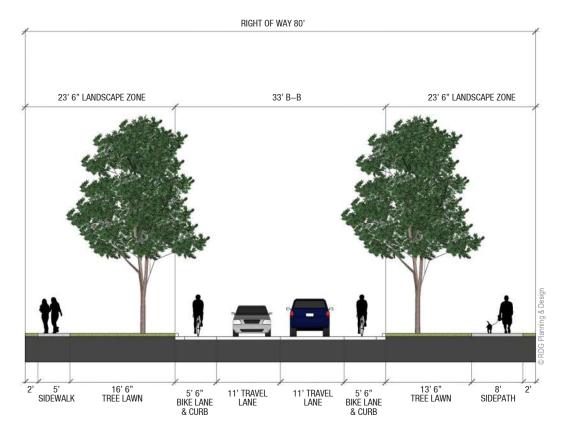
SECTION - 44TH ST. & 35TH AVE
